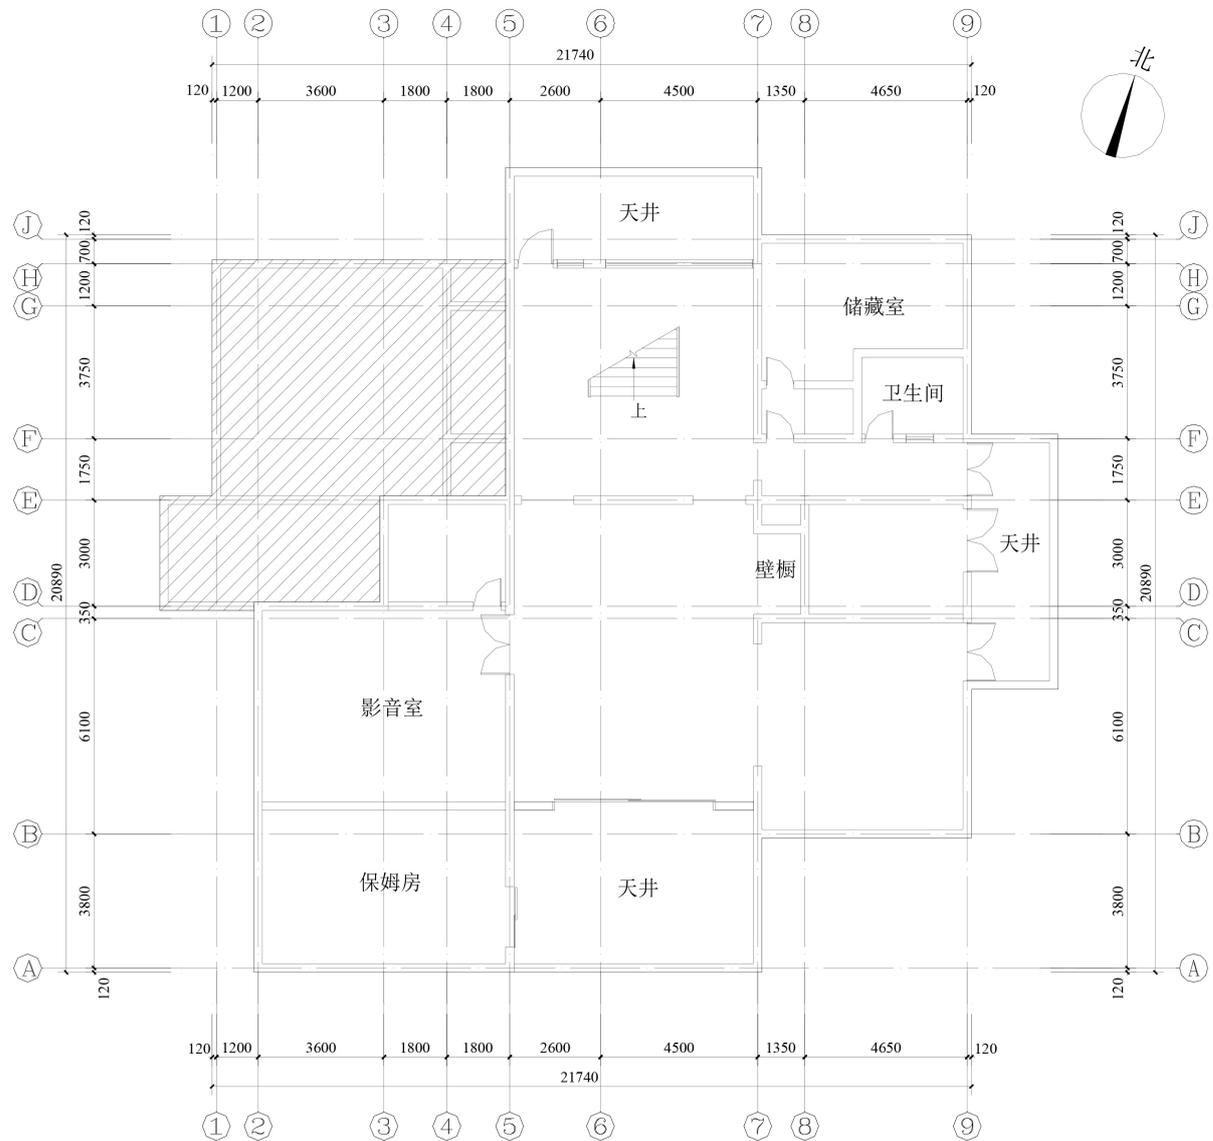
Basement as-built plan (All non-shaded regions are the extended parts.)
